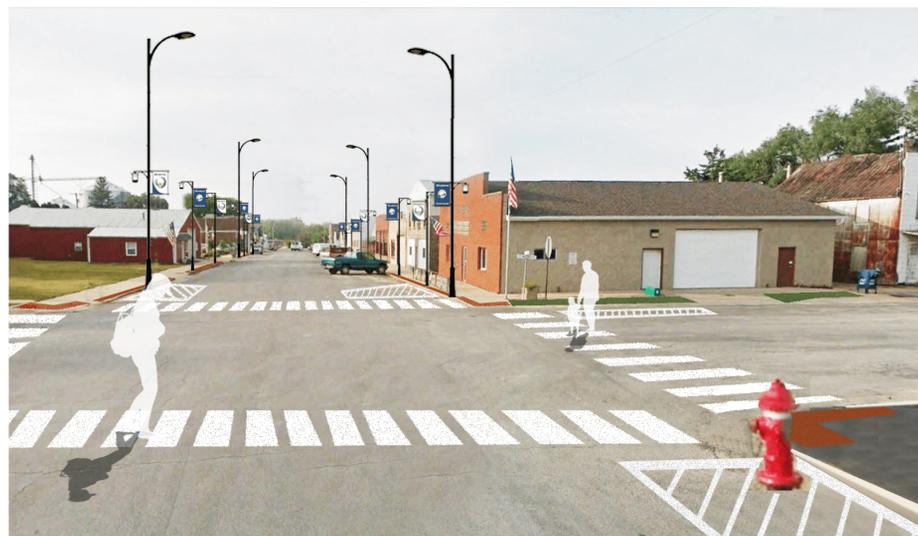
This concept illustrates a retrofit, where the existing paving and sidewalks remain
